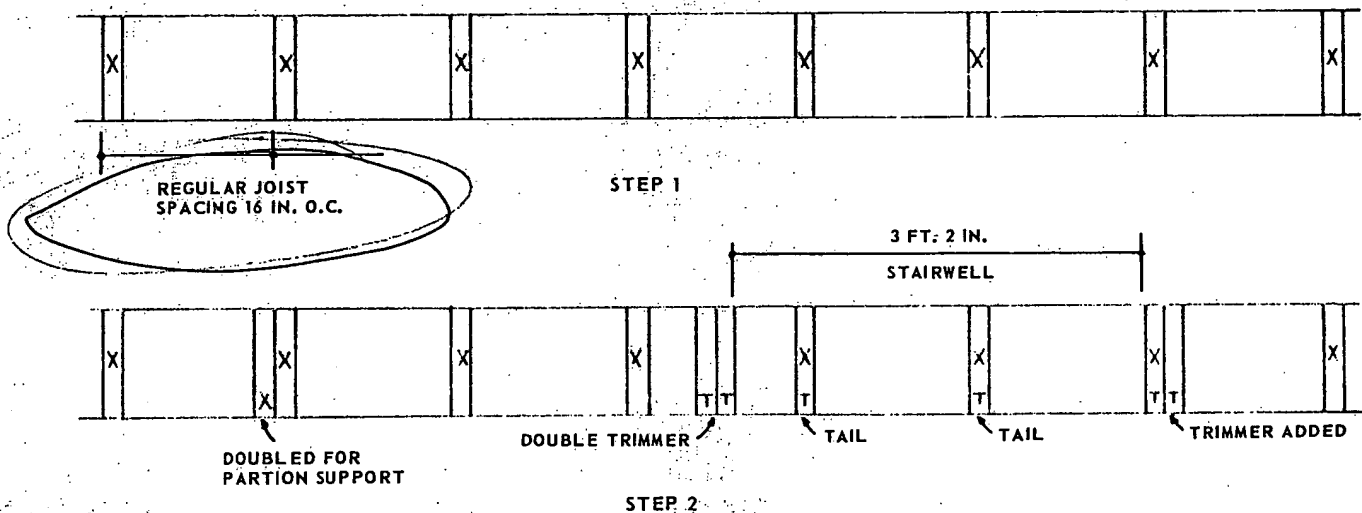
Header joist layout. Use a rod to lay out the regular joist spacing, and then add the position of double and trimmer joists.
